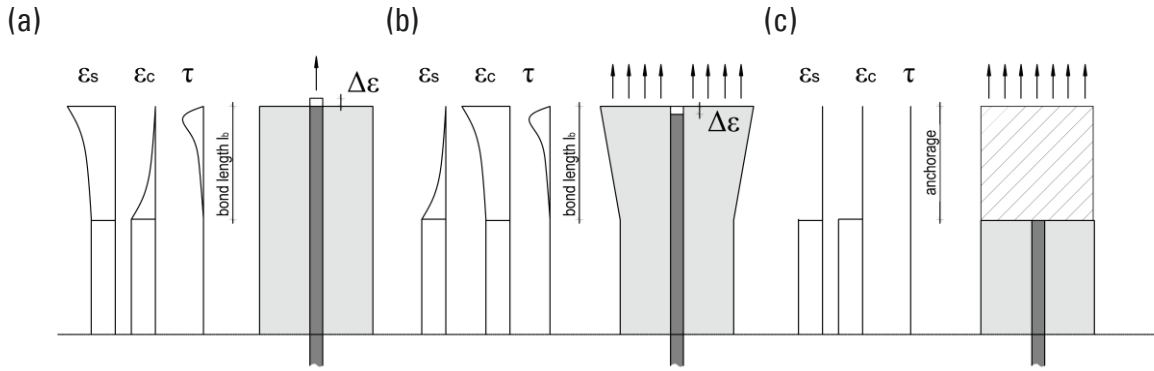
Examples of connection types for testing of reinforced tension members with loading of (a) rebar, (b) concrete and (c) uniform loading
